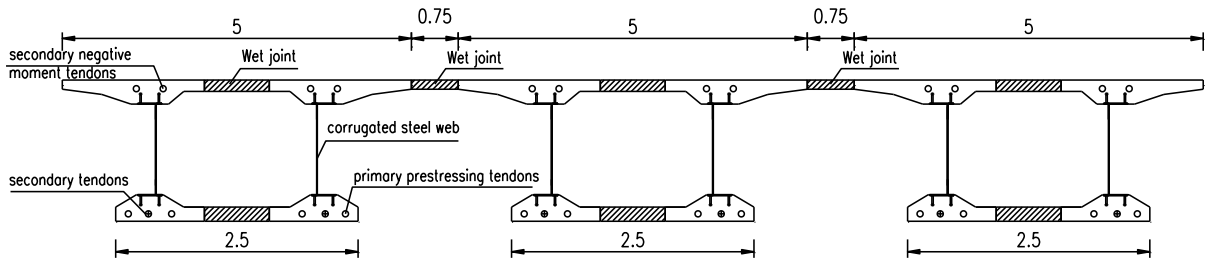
Schematic diagram of composite beam structure section - system I (Unit: m)
